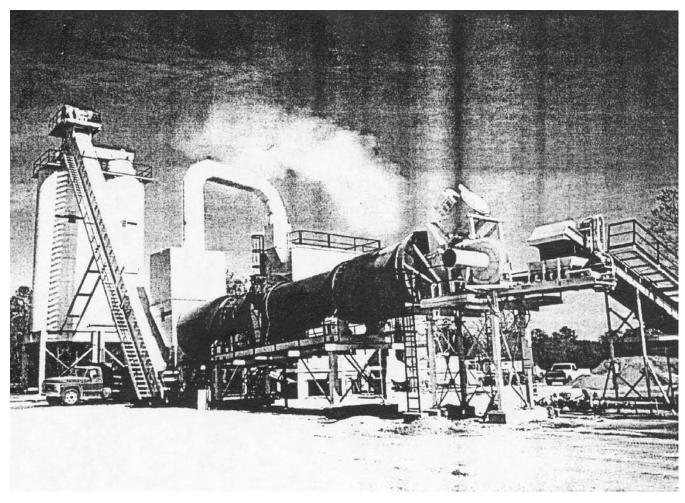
Typical HMA parallel-flow drum-mix plant.
